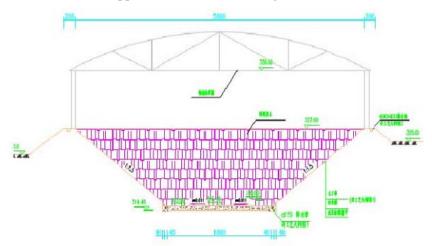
Contaminated Soil Storage Facility of Lafarge Cement Plant
